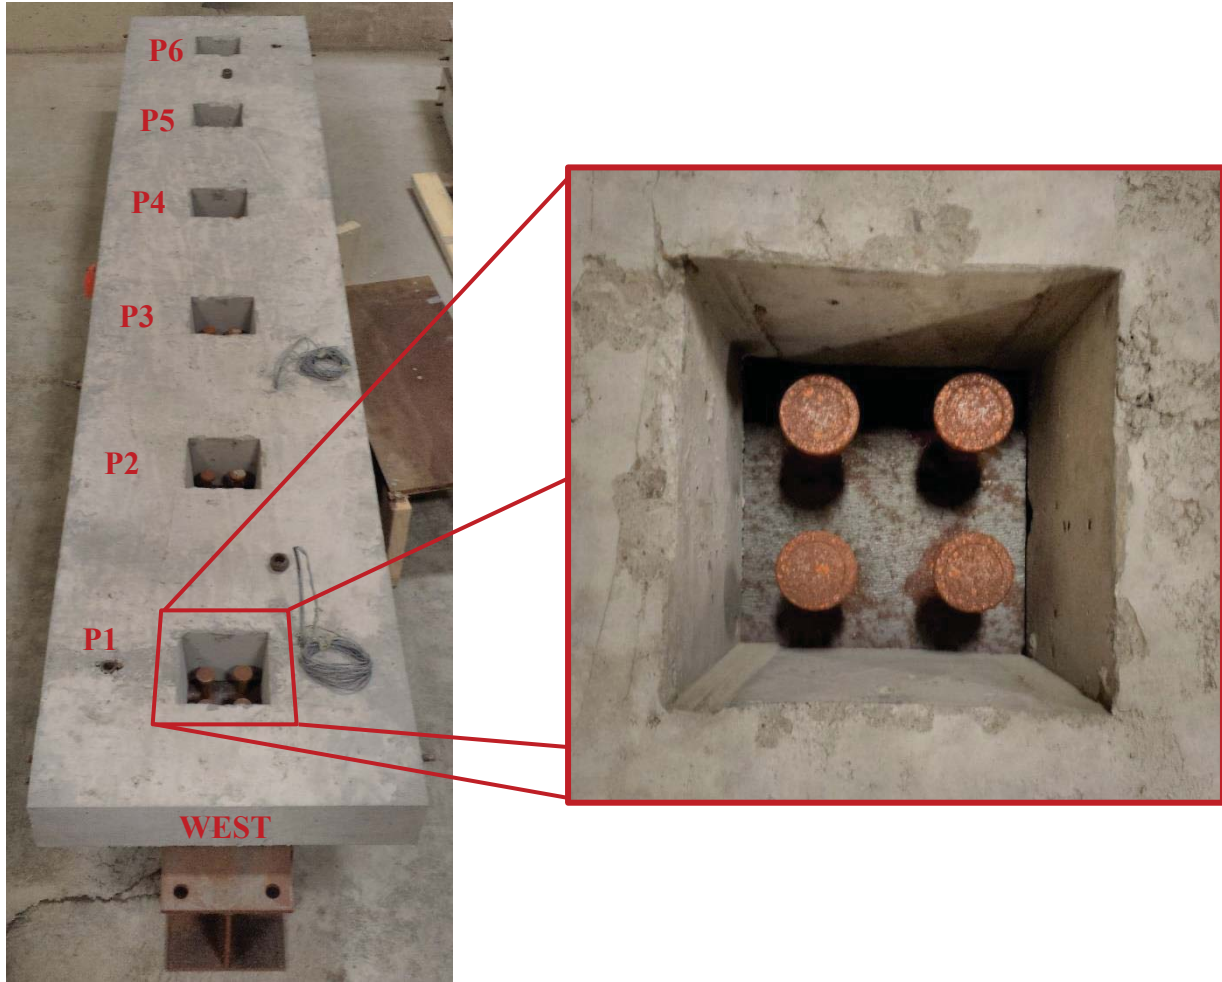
Precast slab positioned on top of the steel beam prior to grouting and establishing the shear connection.
